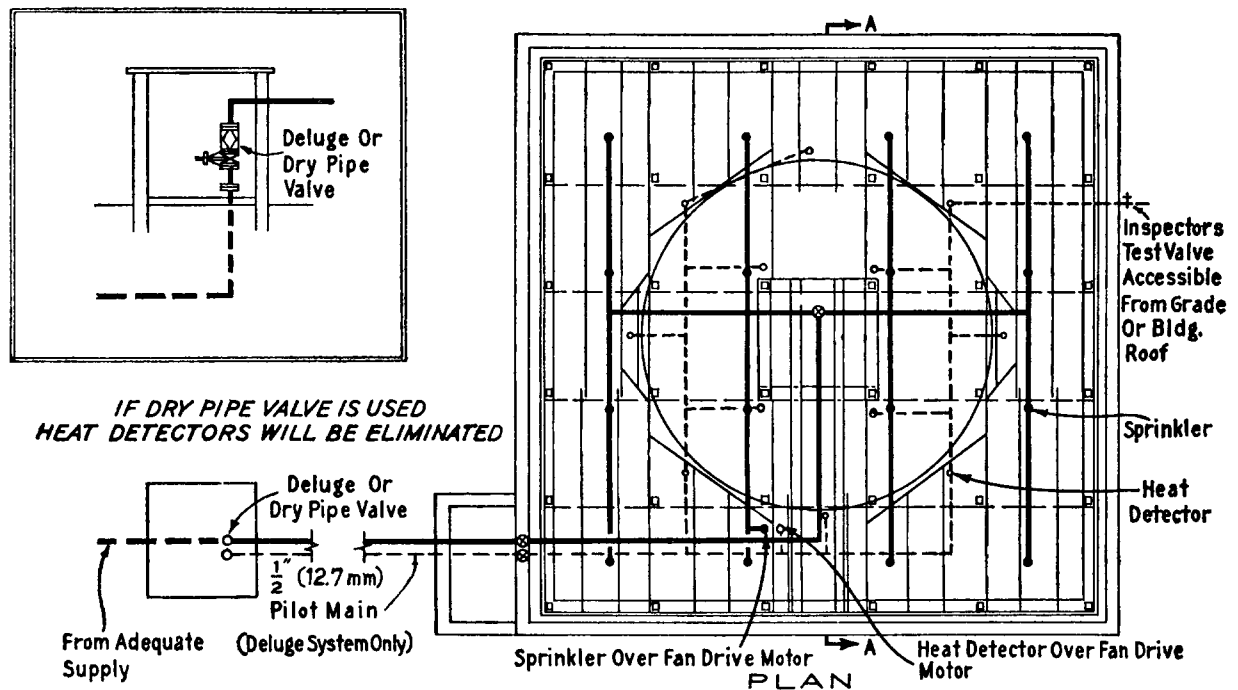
Typical deluge or dry-pipe fire protection arrangement for counterflow towers.
